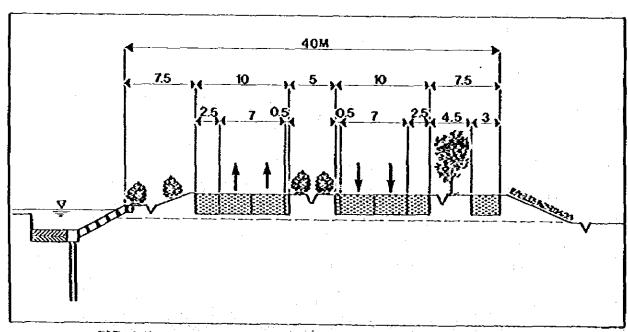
TYPICAL CROSS-SECTION TOLL EXPRESSWAY ACCESS
